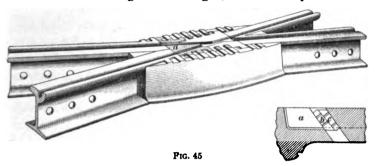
indicates the arrangement of the renewable parts in a guarantee-curve crossing. The hardened-steel plate a is held by the wedges b and c, which are embedded in zinc to prevent them from working loose. To remove the plate, the wedges are driven down.
